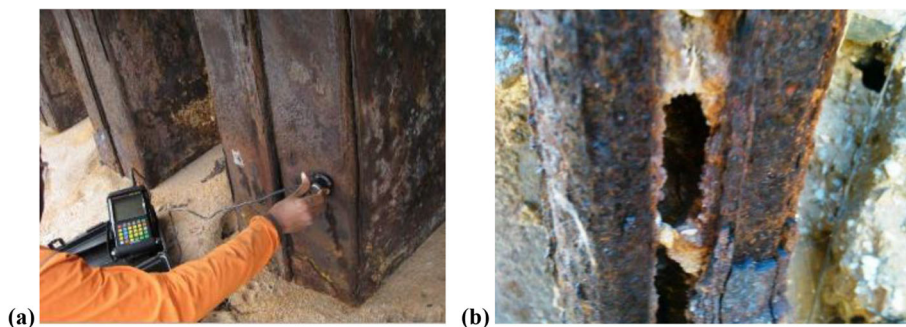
Typical examples of severe corrosion damage on steel sheetpile seawalls [71]: a Section thickness testing; b Perforation at joint
